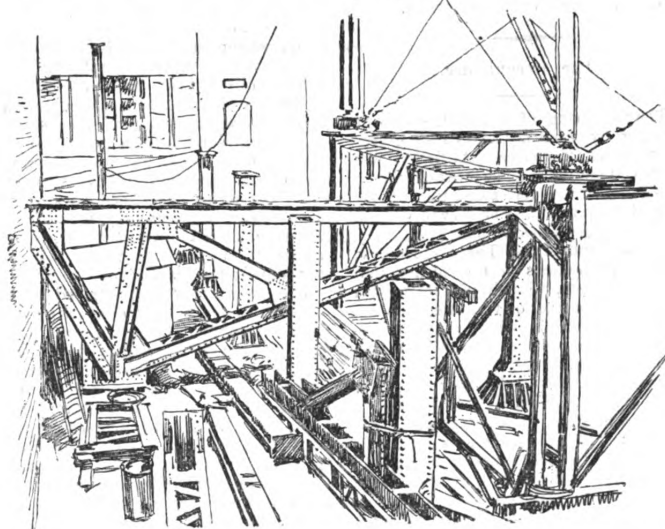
View of One of the Cantilever Trusses Employed in the Foundations of the American Tract Society's New Building.
